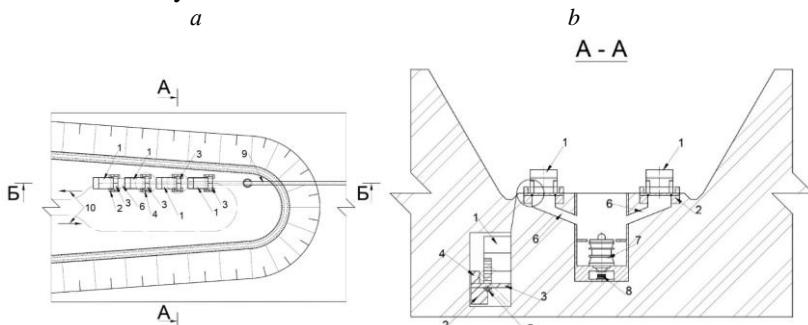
Through point of unloading of dump trucks in design a and section b: 1 - dump truck; 2 - enforced concrete support beams; 3 - unloading bridges; 4 - counterweight fences; 6 - ore pass; 7 - cone crusher CKC-1500/180; 8 - plate feeder; 9 - steeply inclined conveyor; 10 - direction of dump trucks movement
